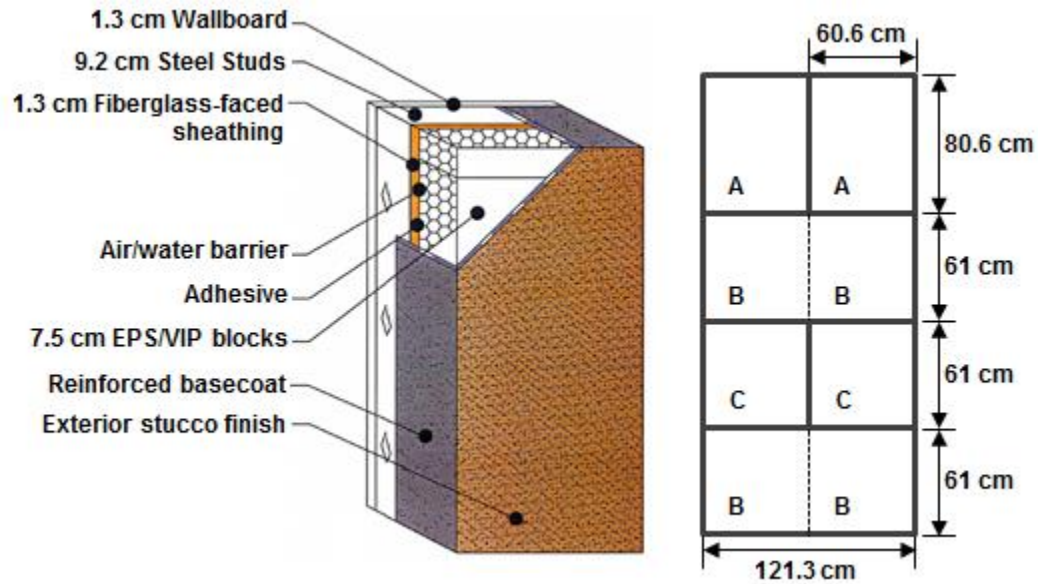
Left: Schematic showing wall construction details; Right: Layout of EPS/VIP blocks.
